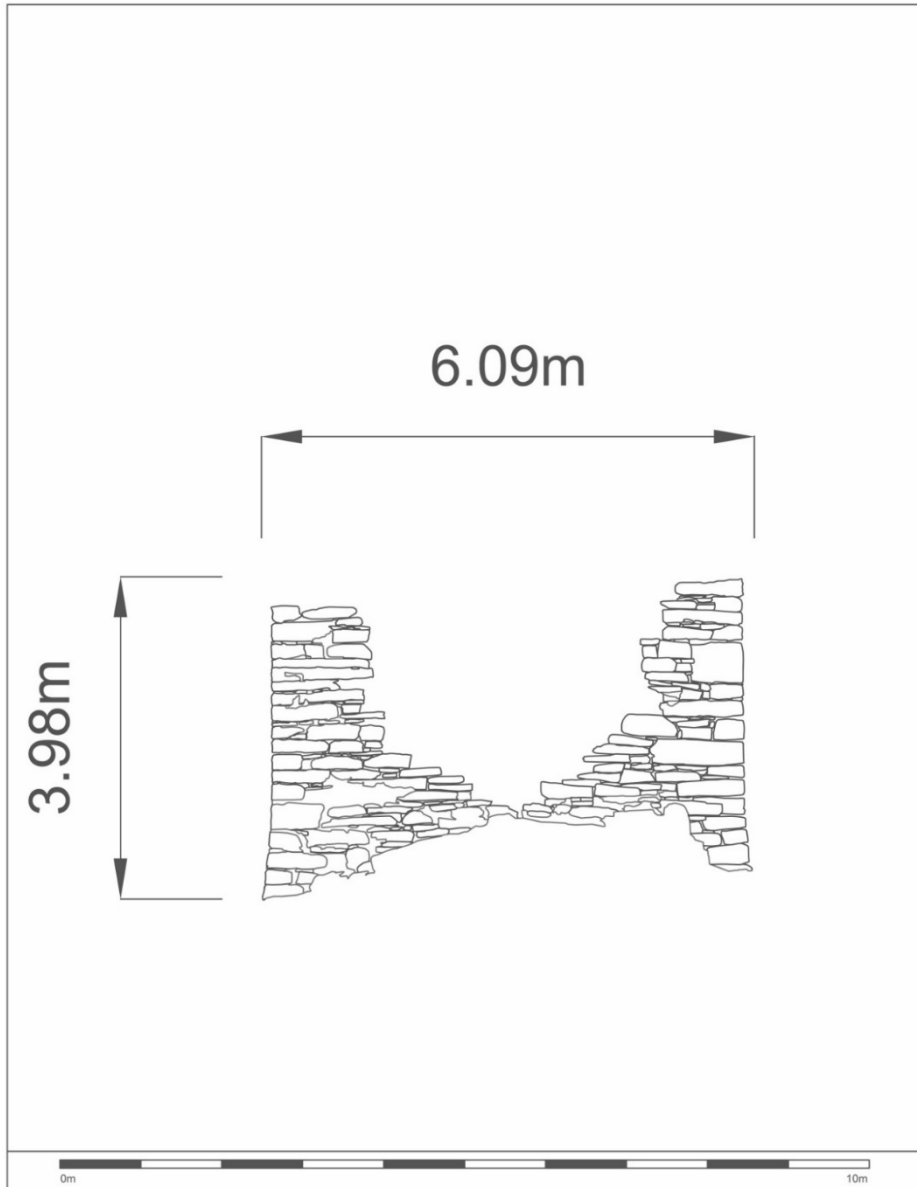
External elevation of the north wall of Saddle Hill Signal Tower.
